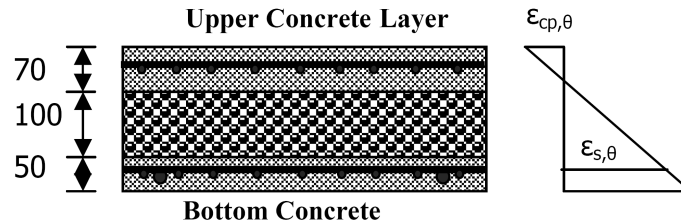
Cross section in the panel showing 4-mm steel meshes and 8-mm additional bottom steel (dimensions in millimeters)
